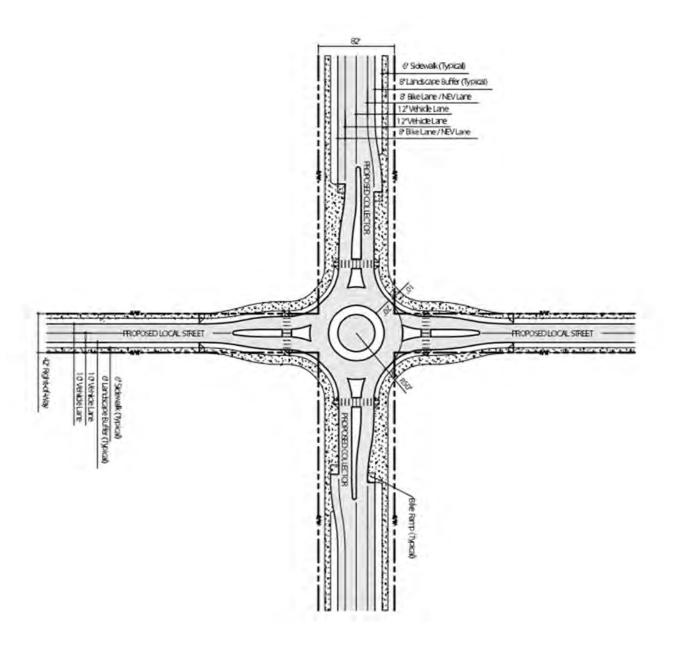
TYPICAL ROUNDABOUT – COLLECTOR TO LOCAL ROAD
